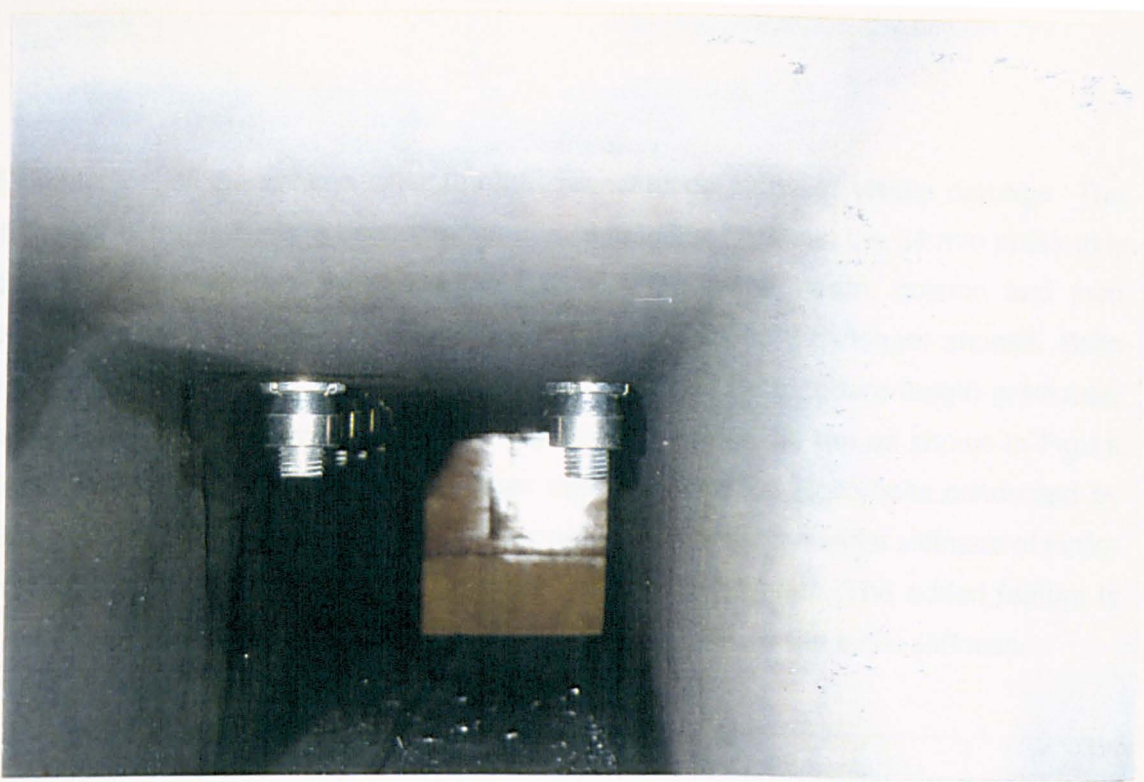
Details of Modified Holo-bolt used in joint test 32b
